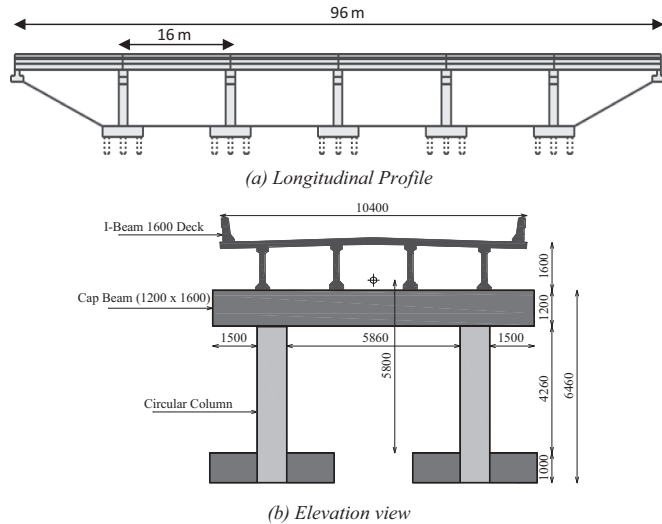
Details of prototype bridge (all dimensions are in mm).
